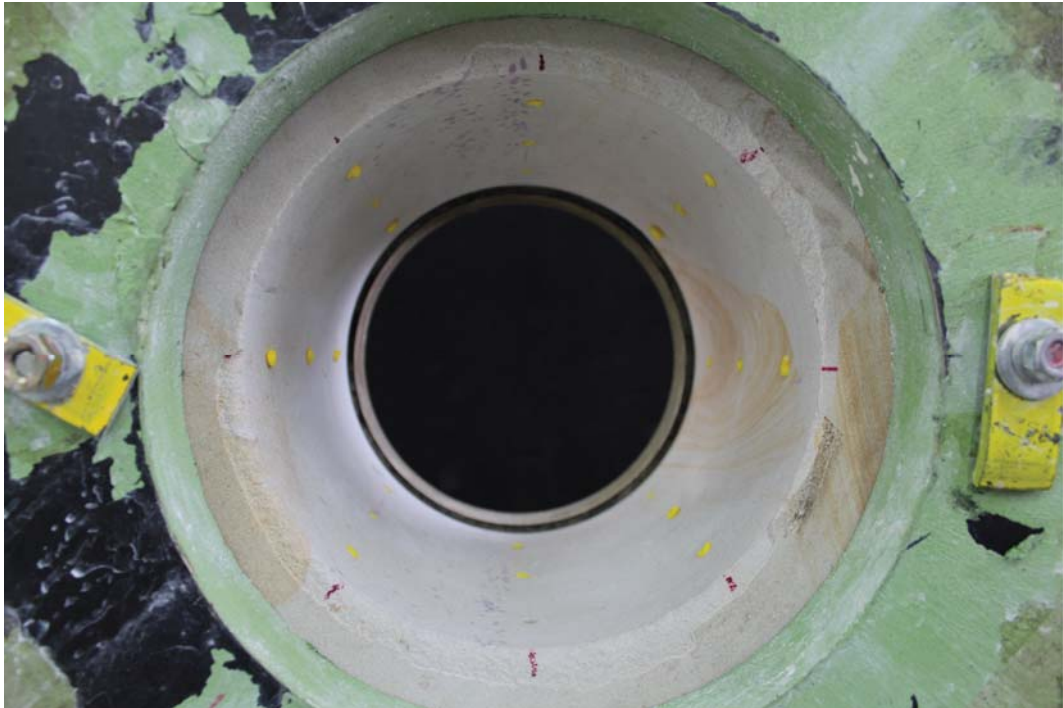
An example of a scaled down tunnel before shotcrete application.
